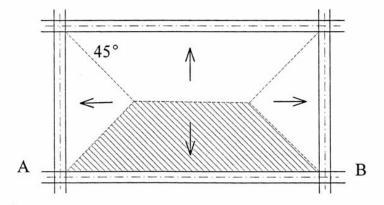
Supporting beams' contributing areas for reinforced concrete floor system.
